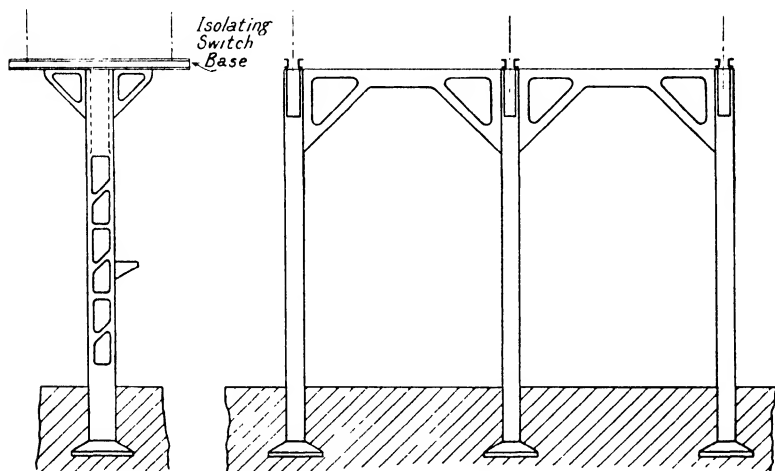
CONCRETE PEDESTAL FOR ISOLATING SWITCH MOUNTING
